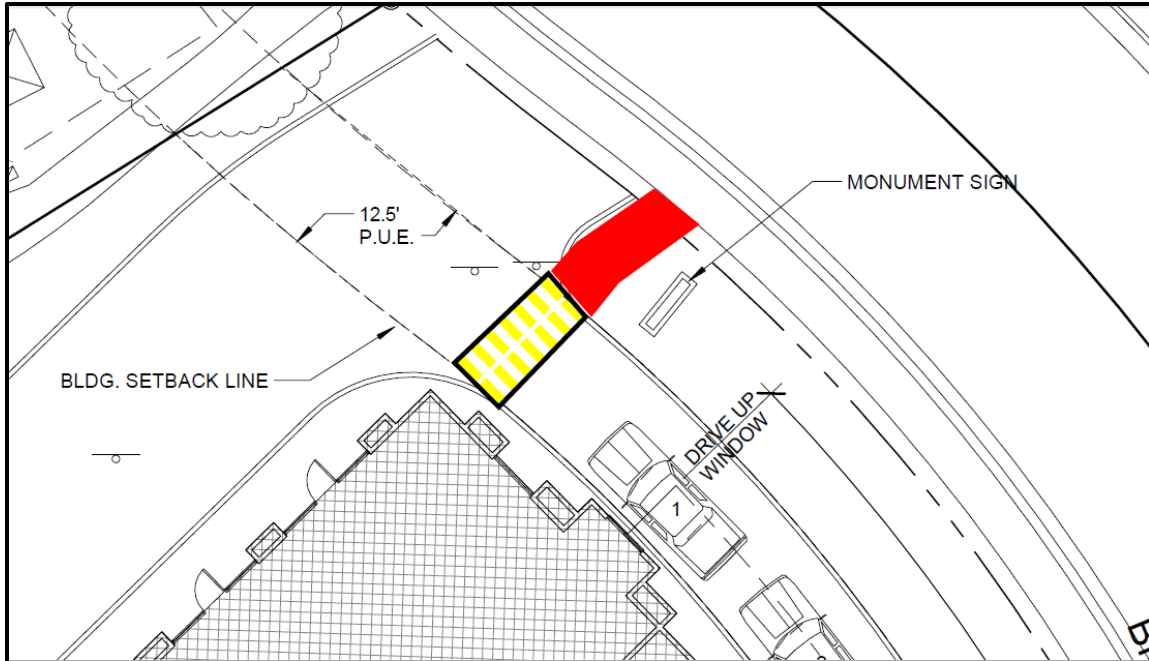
Sidewalk (red) and raised crosswalk (yellow) at northeast corner of building
